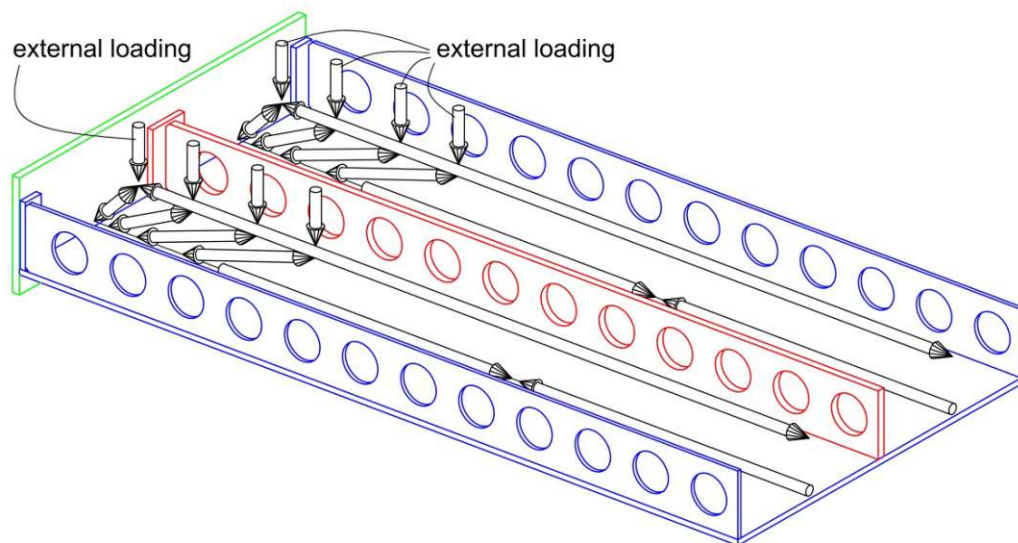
The truss frame model symbolise the force transfer from the external loads to the support through the concrete
